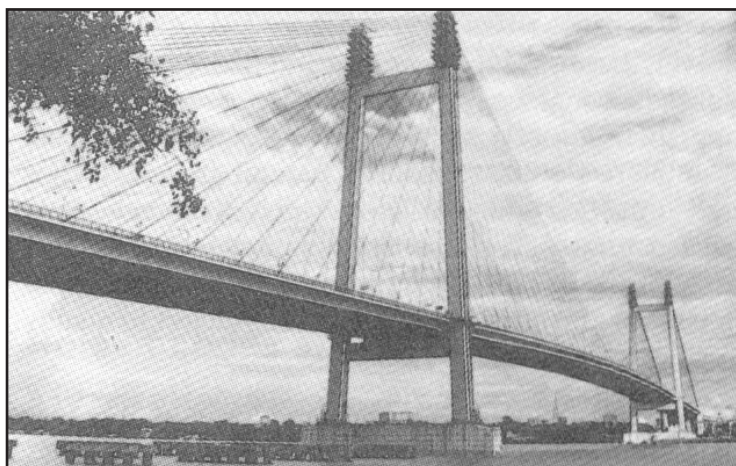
Vidyasagar Setu (second Hooghly bridge) in Calcutta : a cablestayed bridge with a central span of 457 m.
